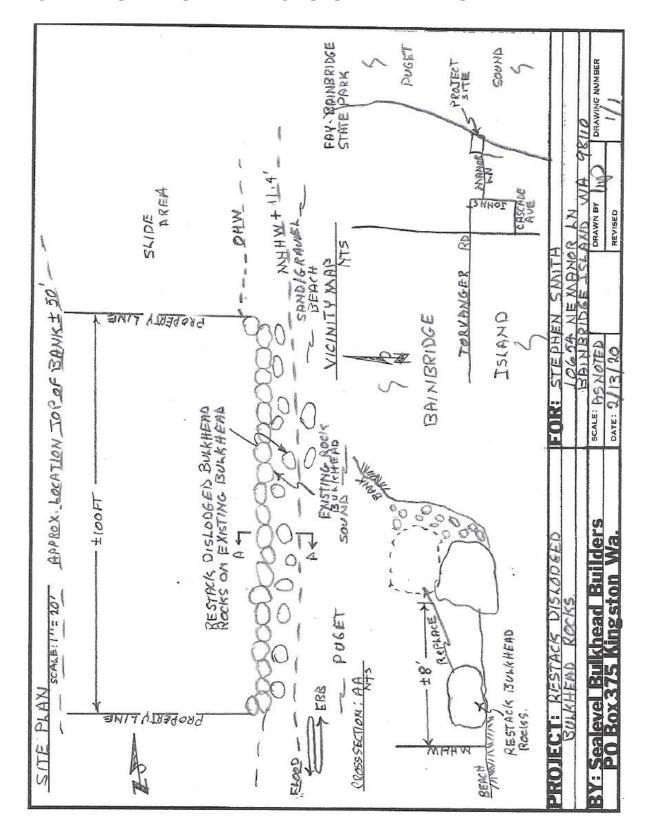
Site plan and profile drawing of proposed bulkhead repairs.
